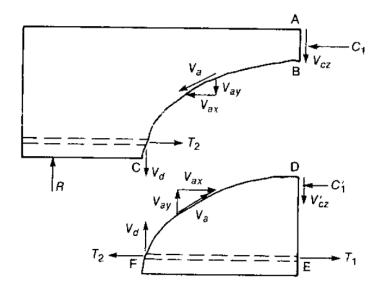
Internal Forces in a Cracked Beam without Stirrups
